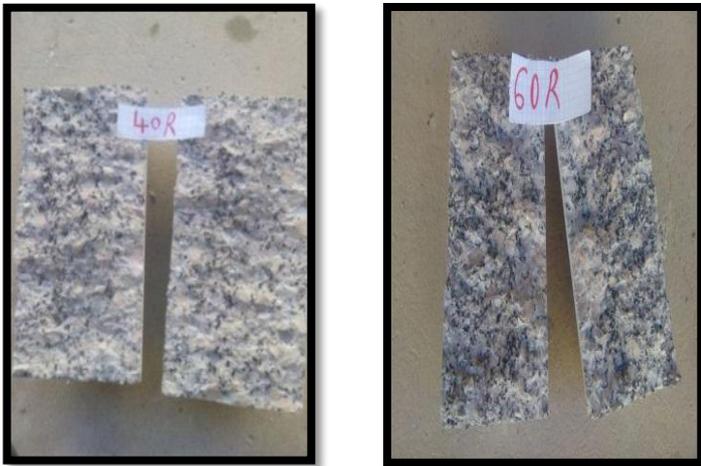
40RW and 60RW specimens failure pattern after split tensile test.
